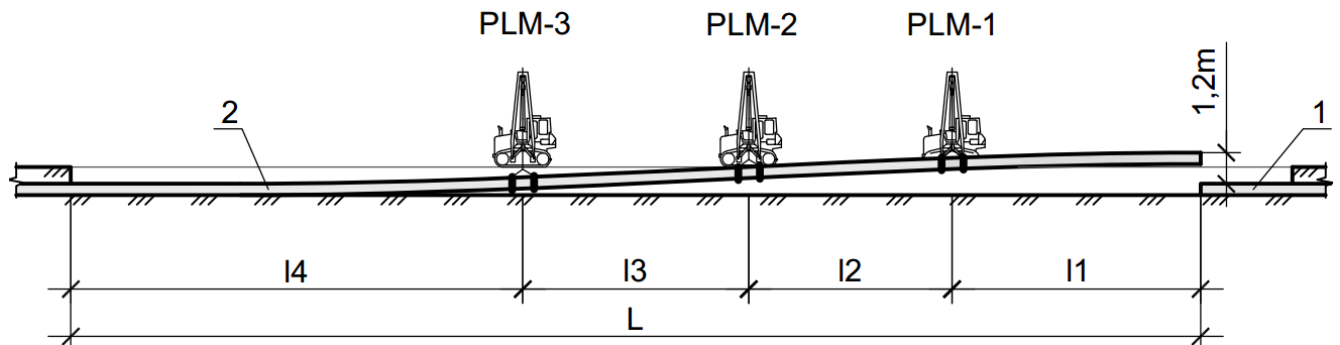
Installation position scheme of the main oil pipeline structure new section: 1 - the existing part; 2 - new part
